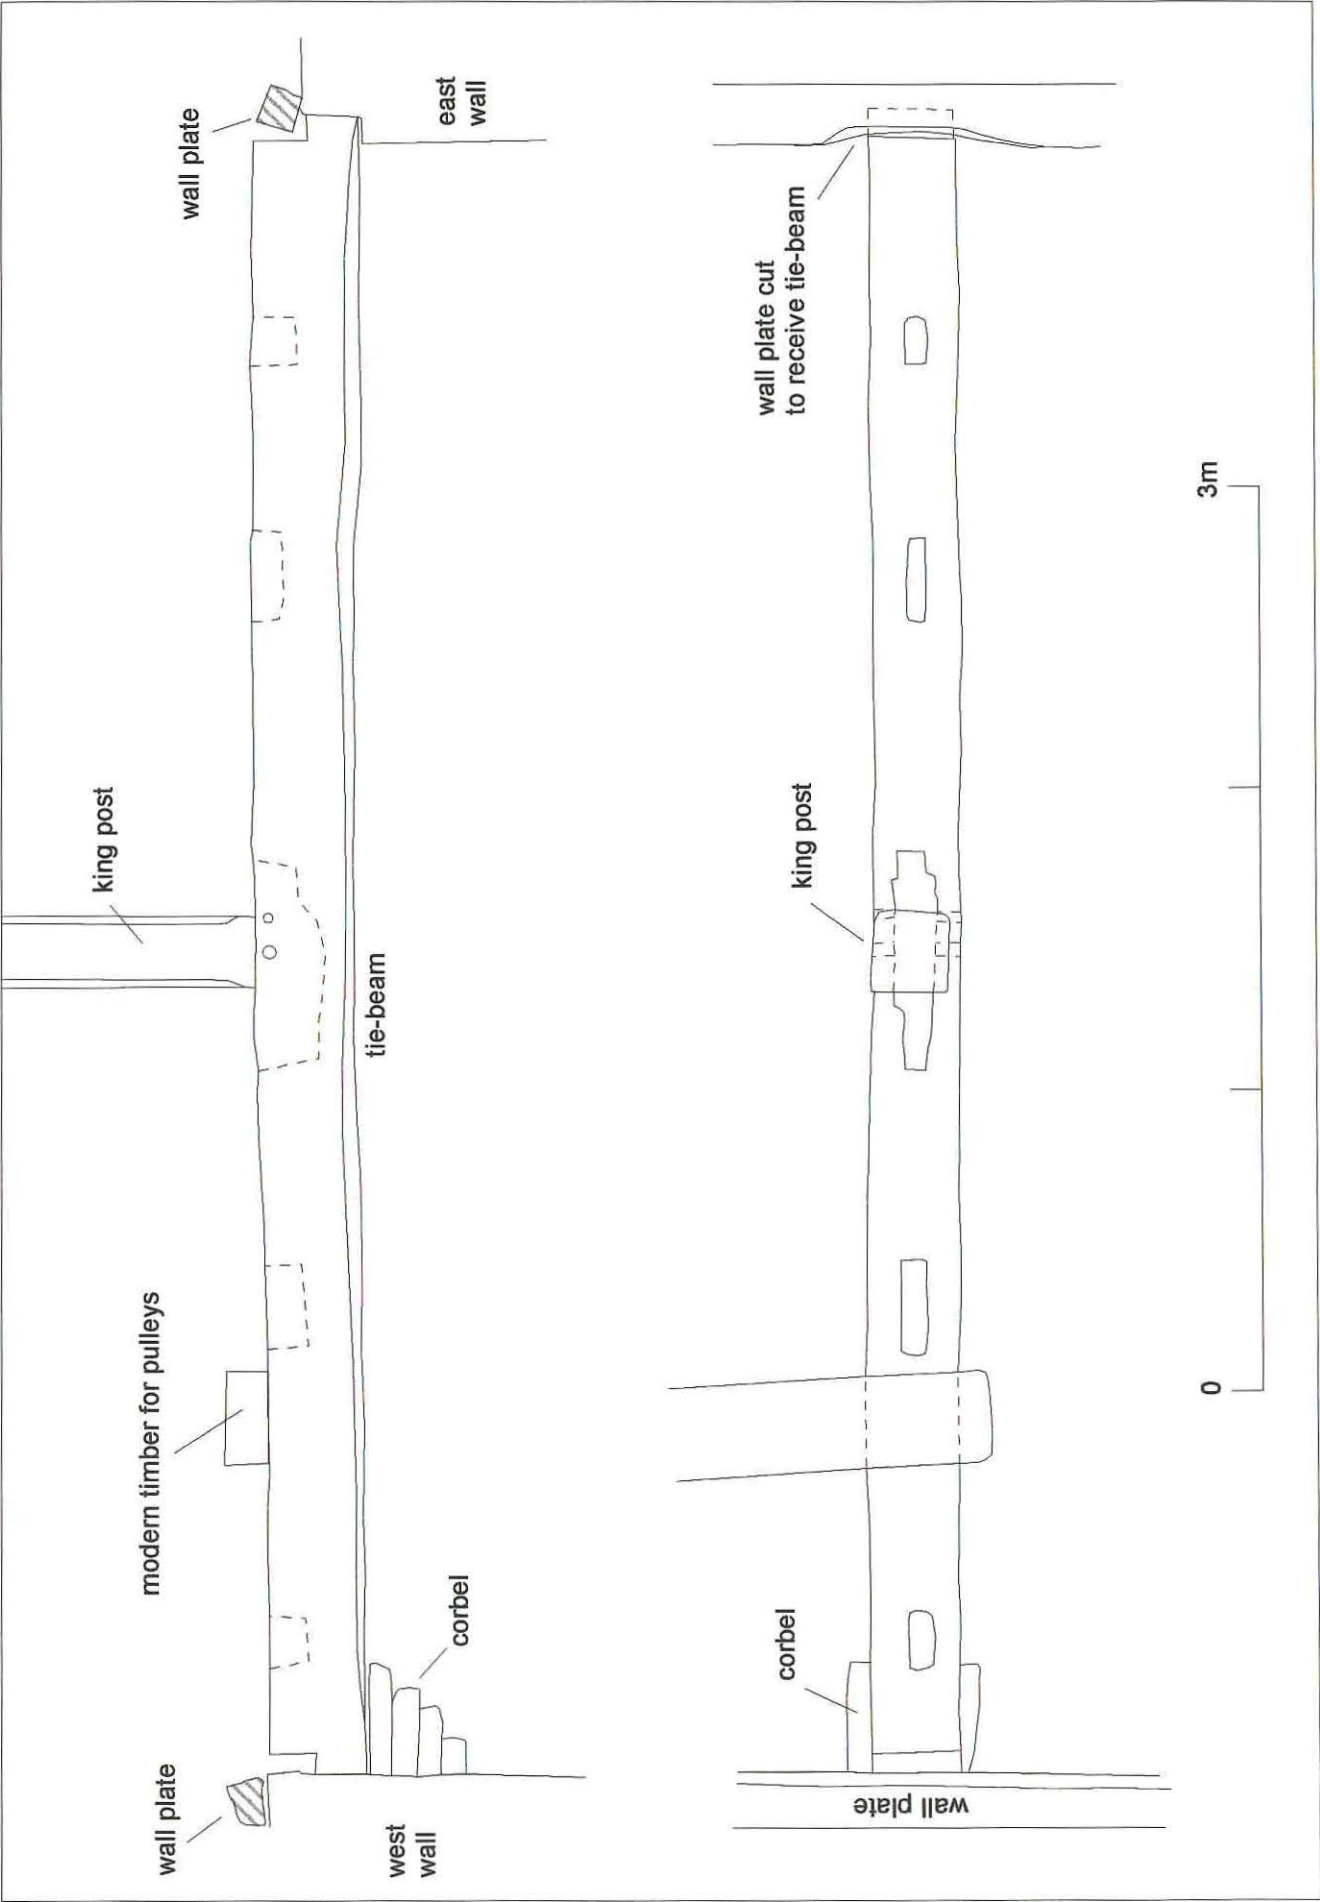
Bell tower roof, tie-beam and king post, scale 1:25
